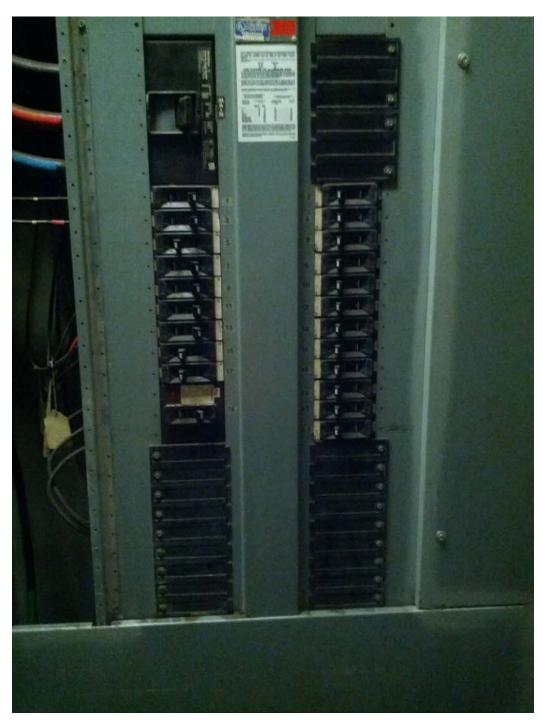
E02 Shaw-Howard U (North) – Panel NF in room 205
